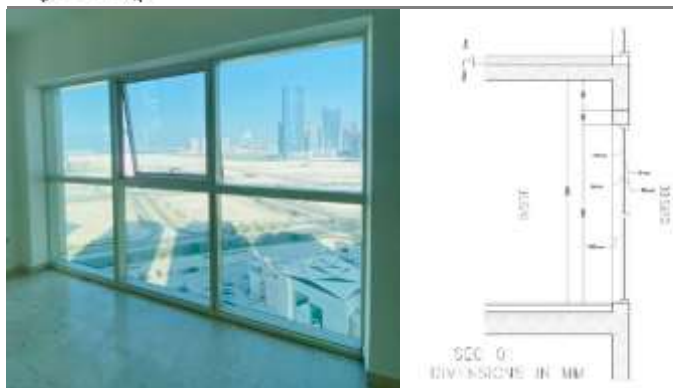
The window picture shows no sill and openable panel for natural ventilation.
